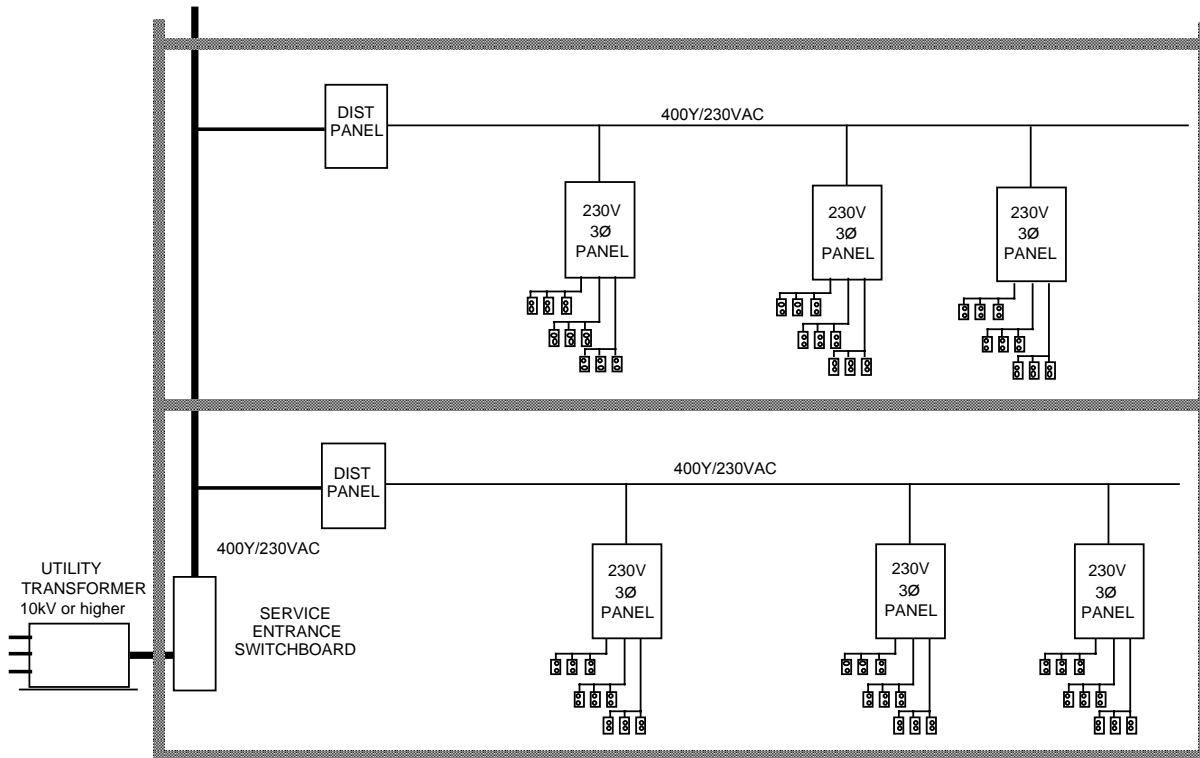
Electrical Wiring Detail in a Typical European Commercial Building
